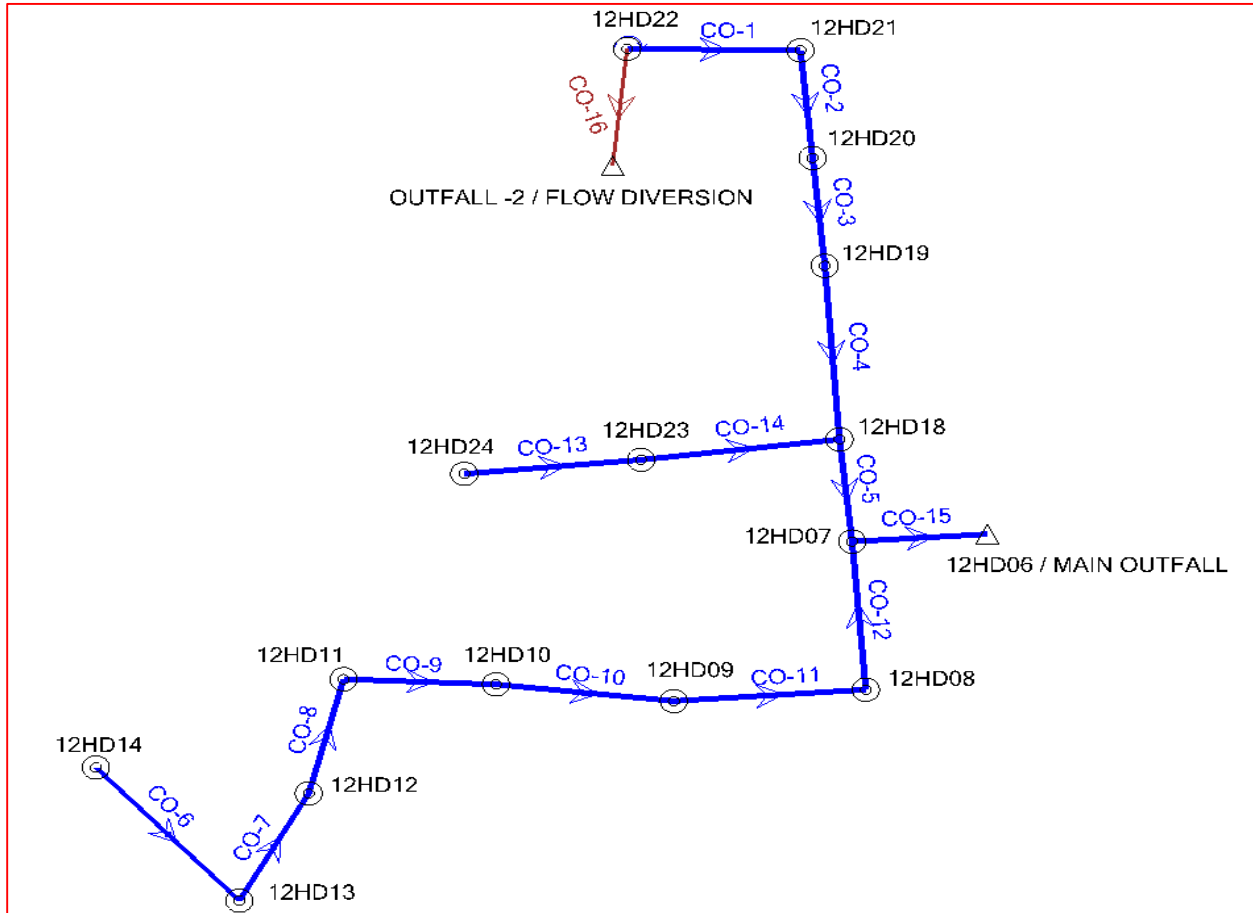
The existing sewer system schematic layout diverting flow through outfall-2
